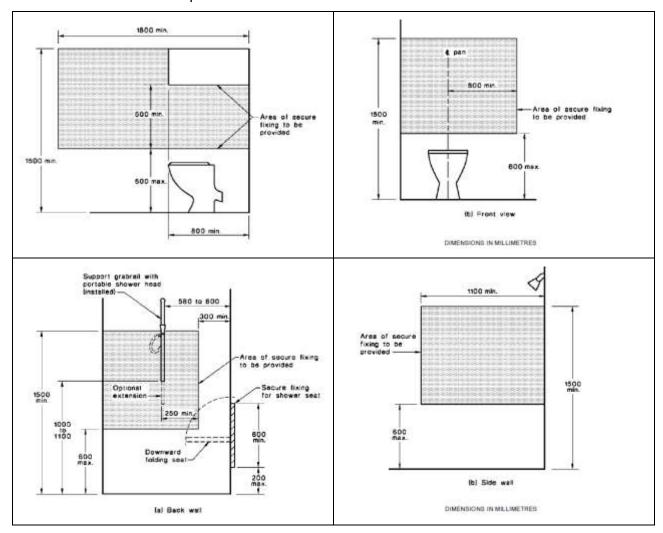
diagrams indicating the wall strengthening zones to locations where grabrails are installed
